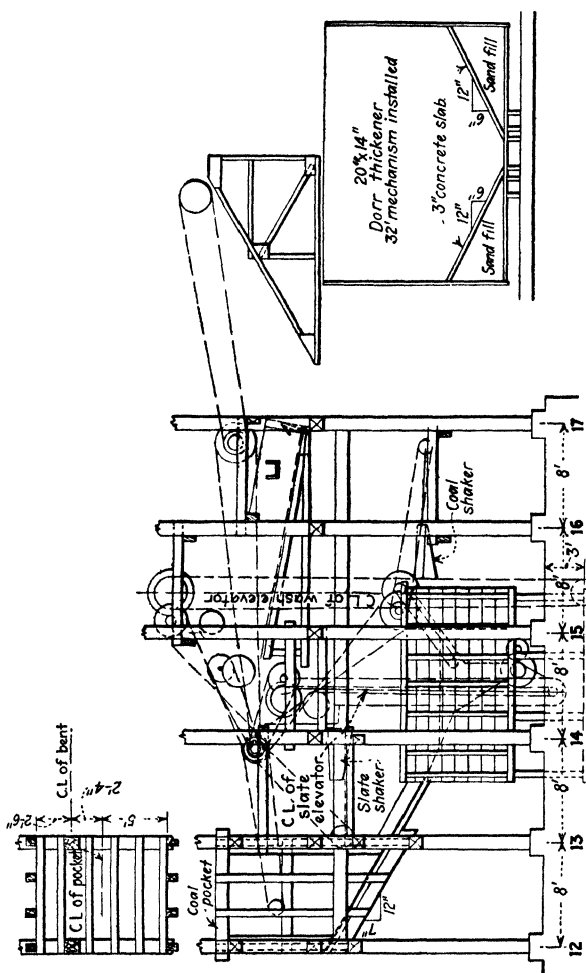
ELEVATION OF CONKLIN SEPARATOR.
